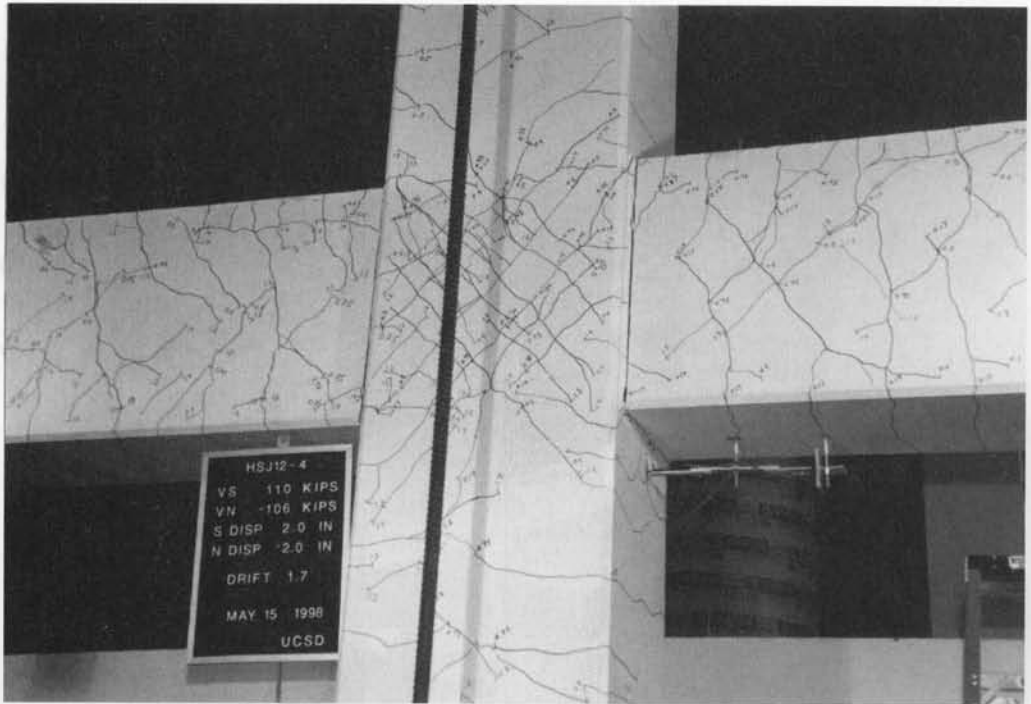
(b) Hybrid Frame Assembly (Ref. 13.24)
